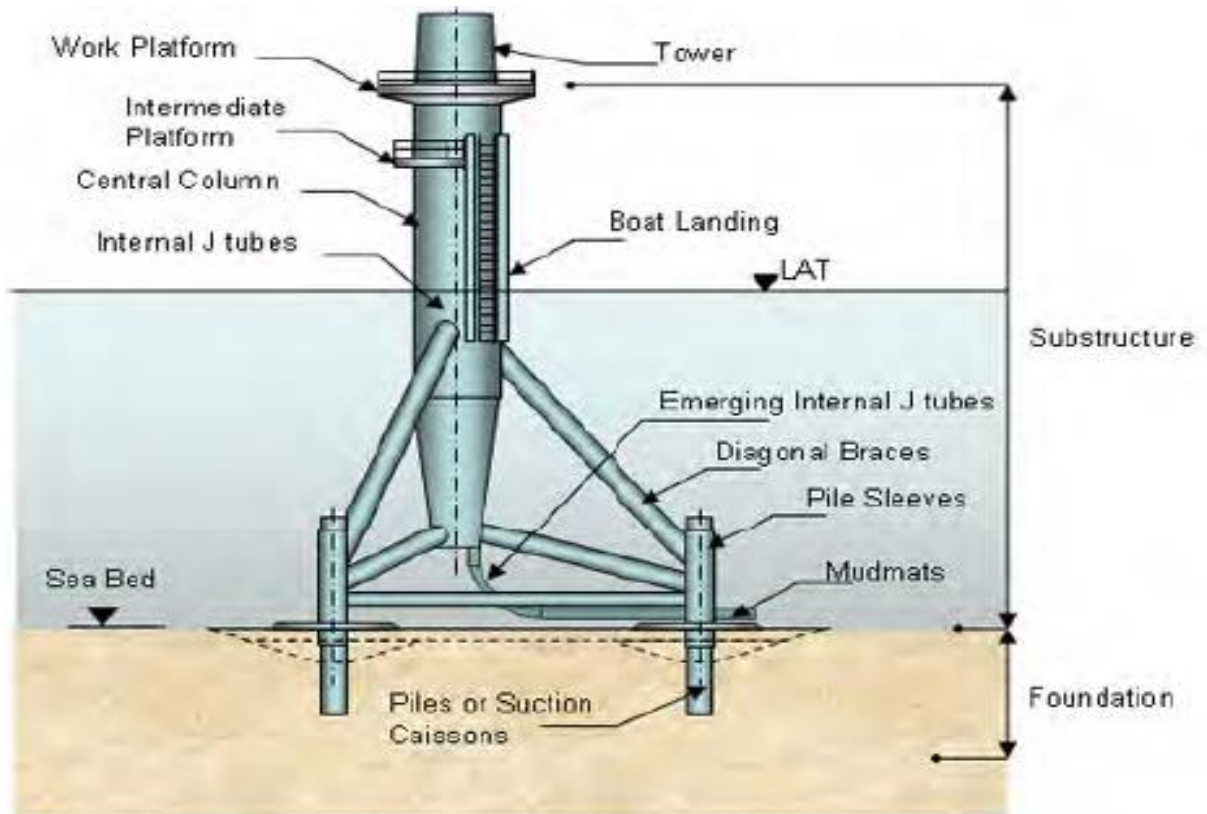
Components of a Tripod Foundation (EWEA, 2009)
